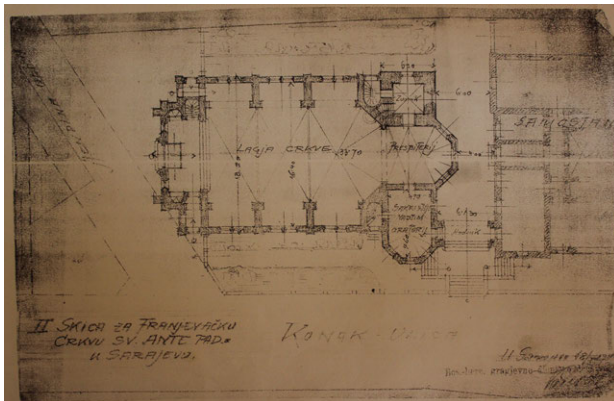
The convent church of Saint Anthony of Padua, Bistrik: ground floor plan, segment of the first project, with apse on the west and access bridge on the south, done by Josip Vancaš (The Convent and the convent church projects, Bistrik)
